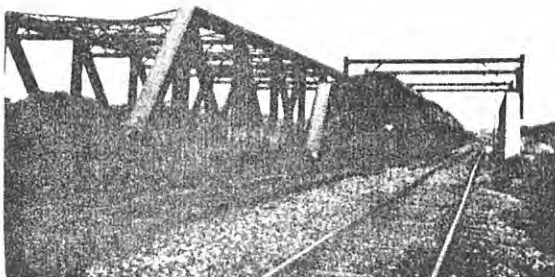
The 1912 through truss (left) and the 1898 pony truss (right) over Ironbark Creek, west of Newcastle.
